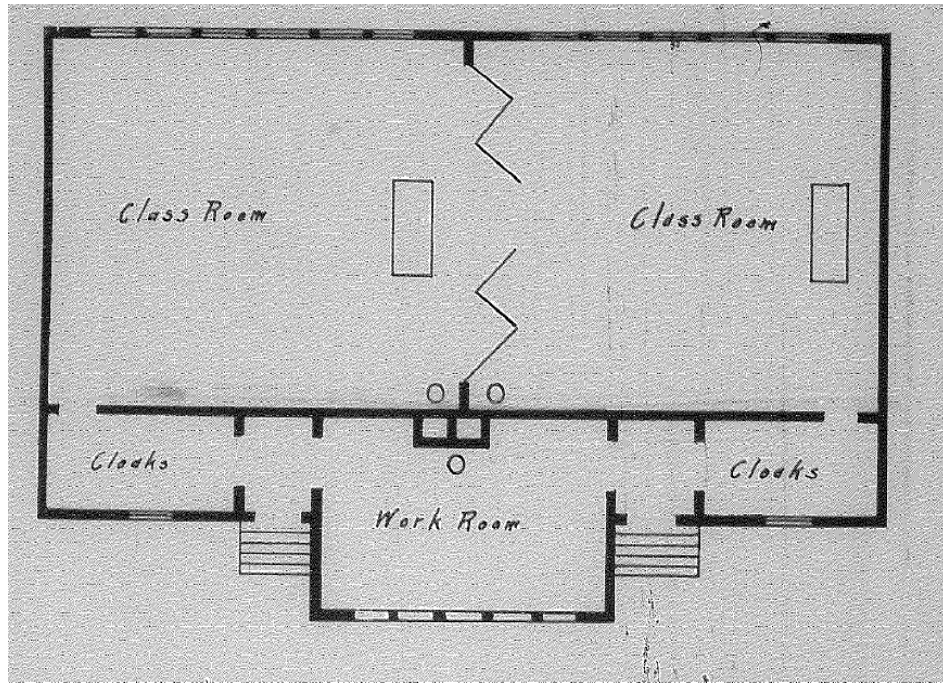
The Alabama Plan for Two Room Schoolhouse. (Wagner 1920:14)
